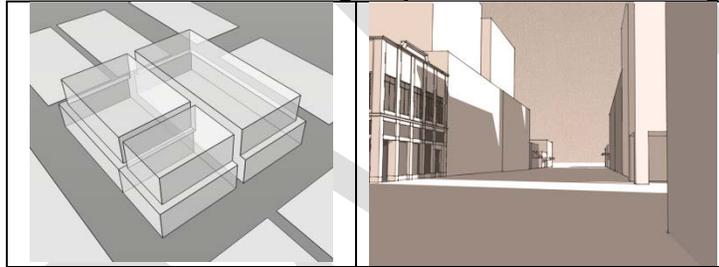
E.2.c.2. Examples of buildings incorporating step backs along the street-facing façade
